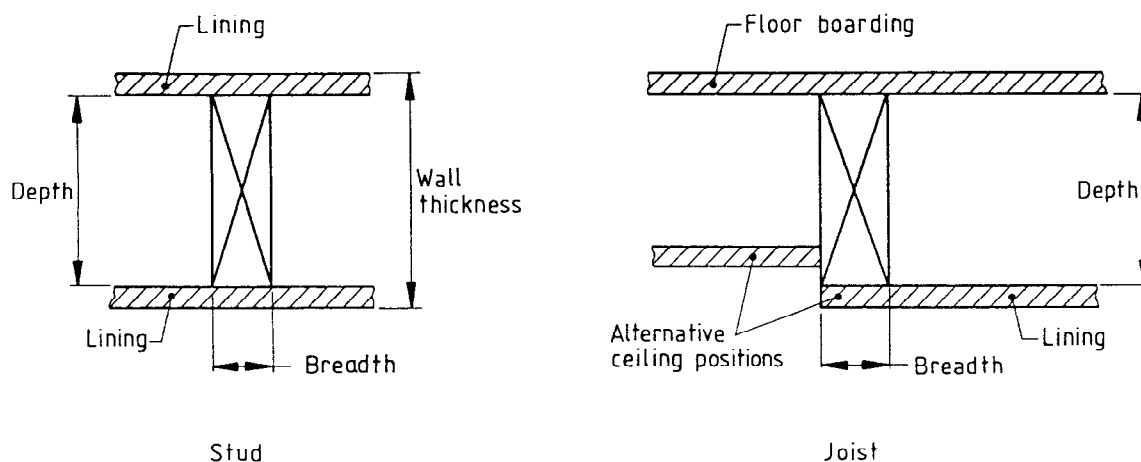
Diagram showing depth x breadth of stud and breadth of joist
